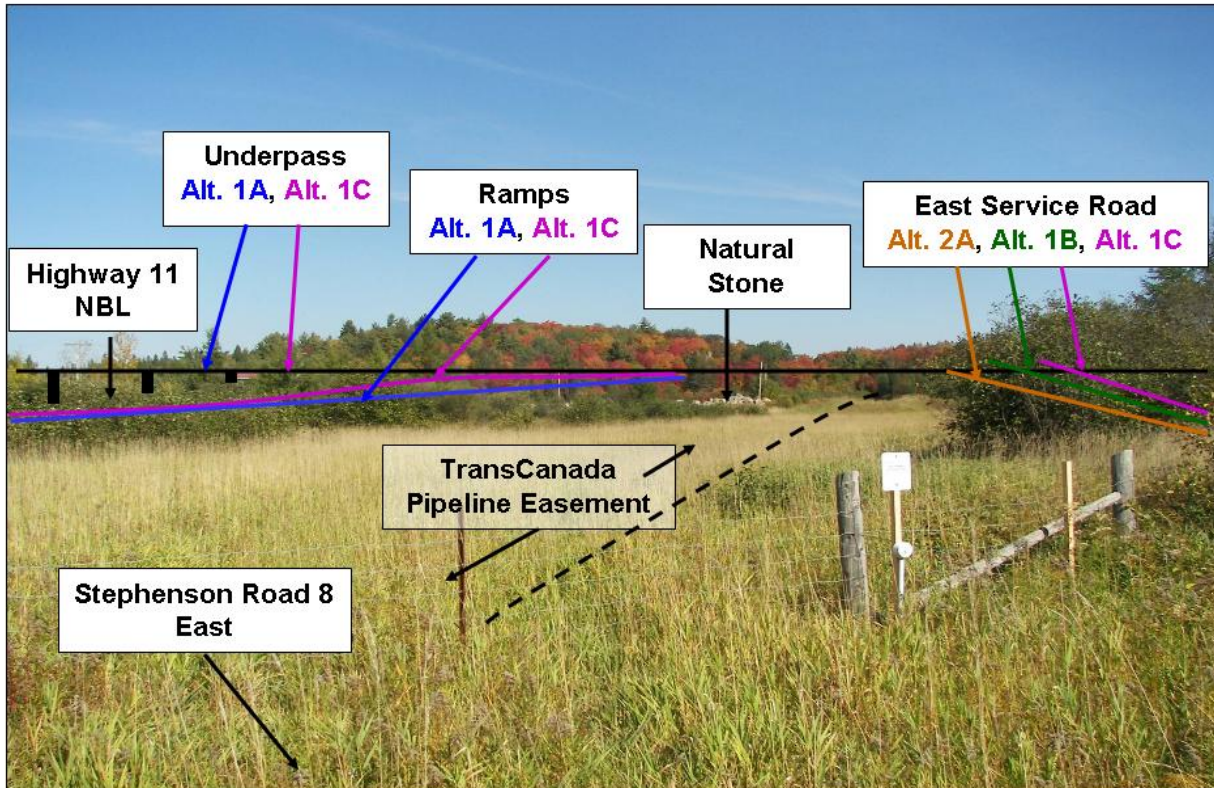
VIEW: Looking west from east shoulder of Stephenson Road 8 at about Sta. 19+080 at the at grade crossing with Highway 11. Swamp area in foreground. (Nov. 2007)
